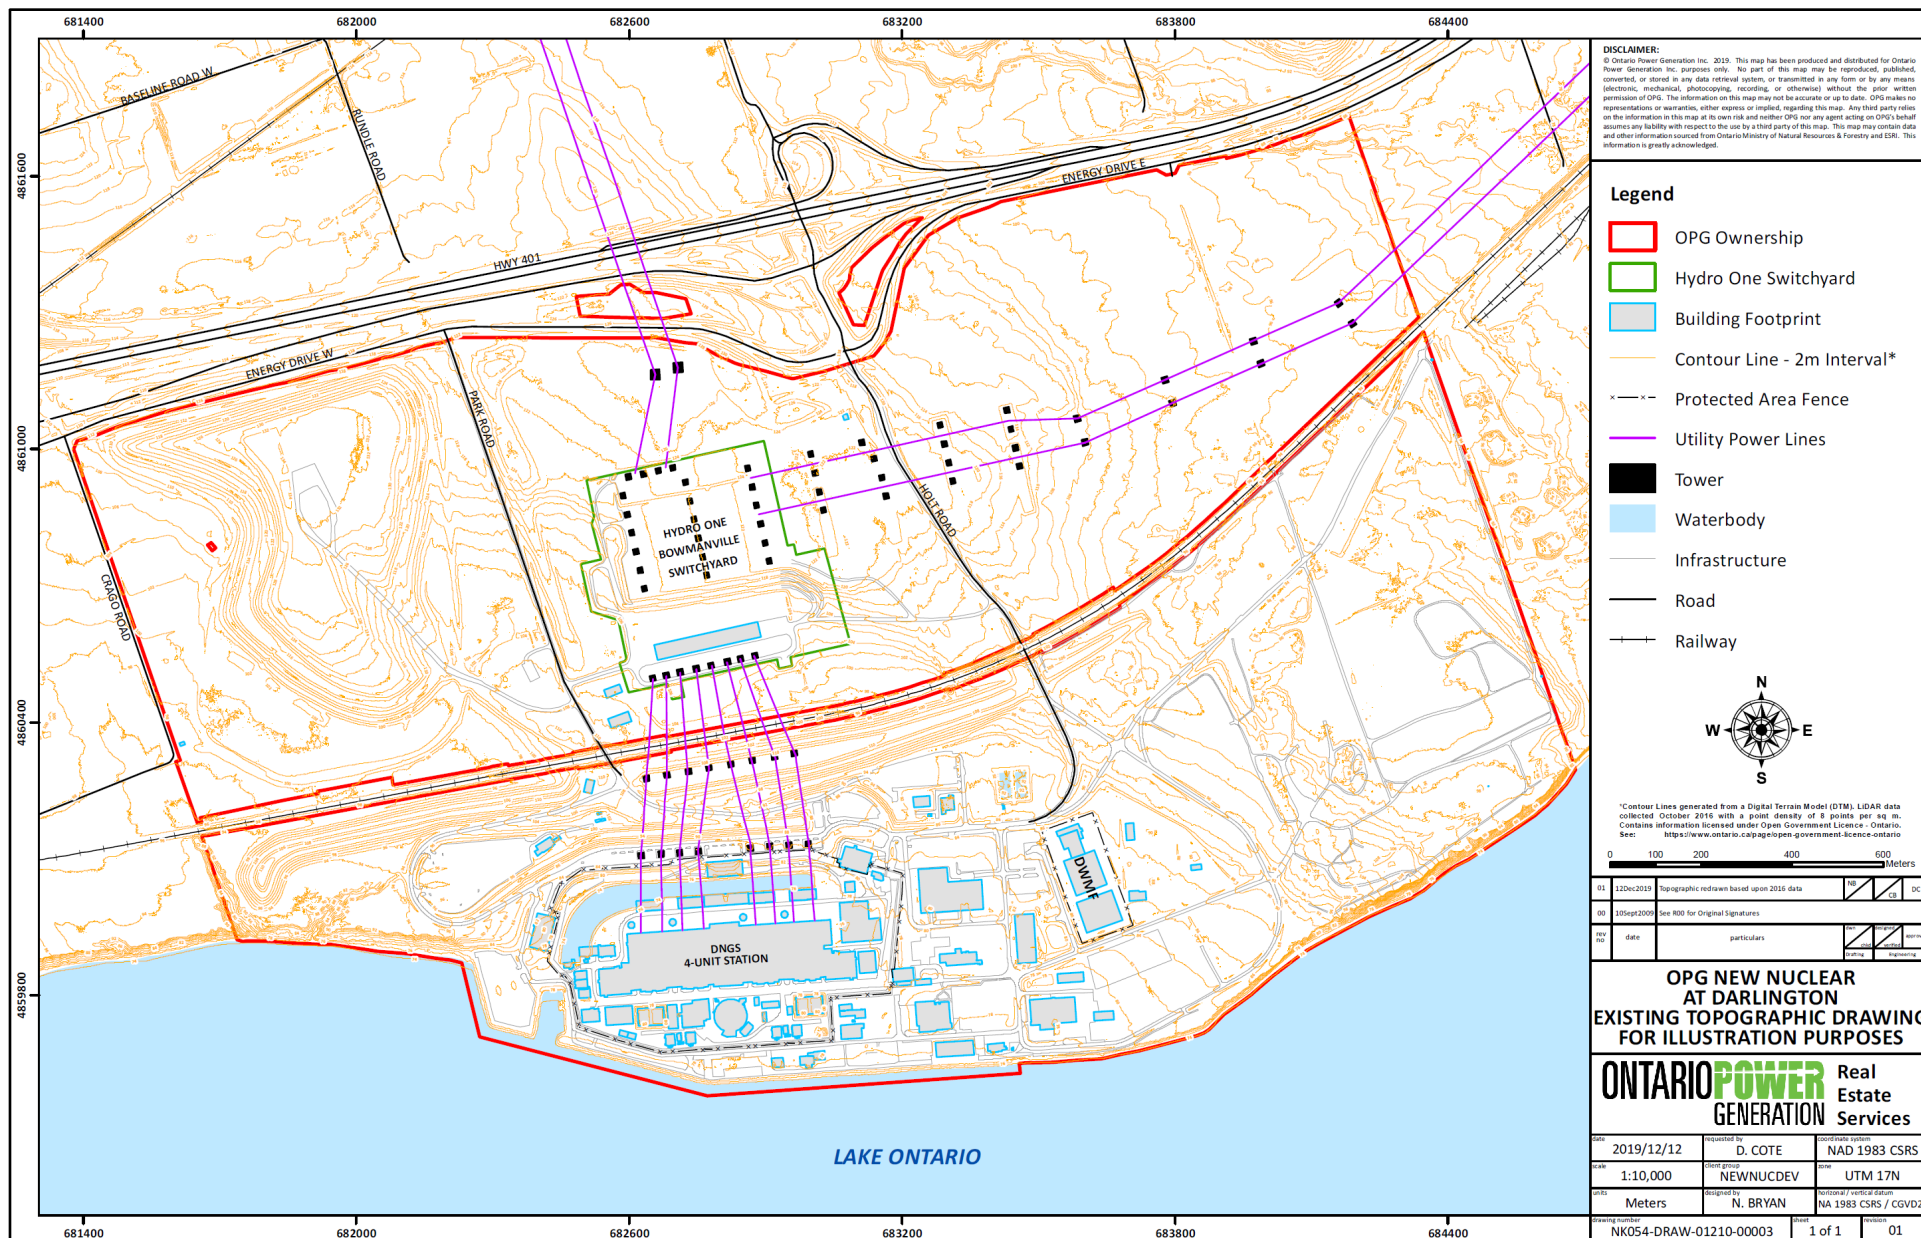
Darlington Existing Site Topographic Drawing
